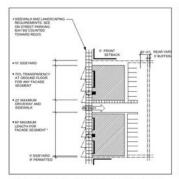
Site plan for intermediate infill site with long frontage and two separate structures.
